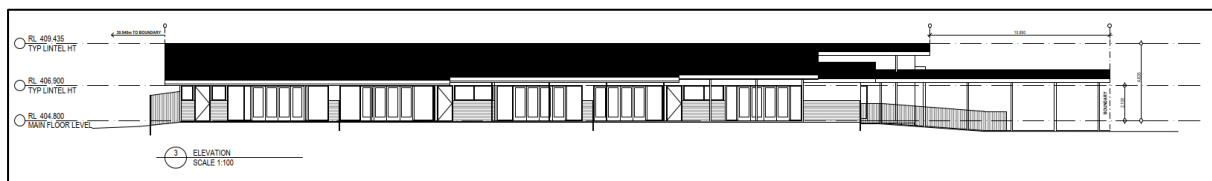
Elevations - Approval Plans (Source: Deborah Fisher Architect 2007)
